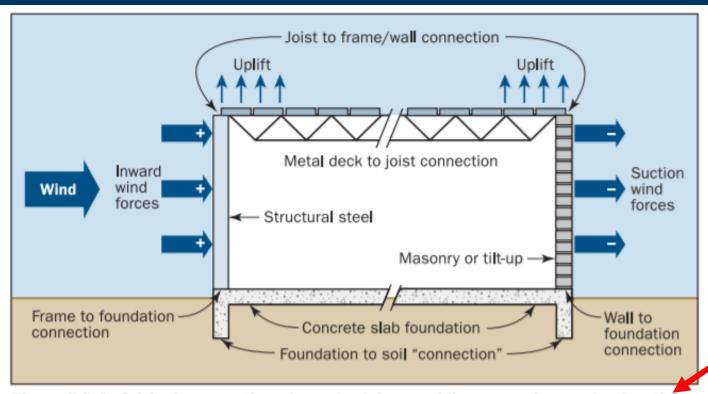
Critical connections important for providing a continuous load path in a typical masonry, concrete, or metal-frame building wall (for clarity, concrete roof deck is not shown)
